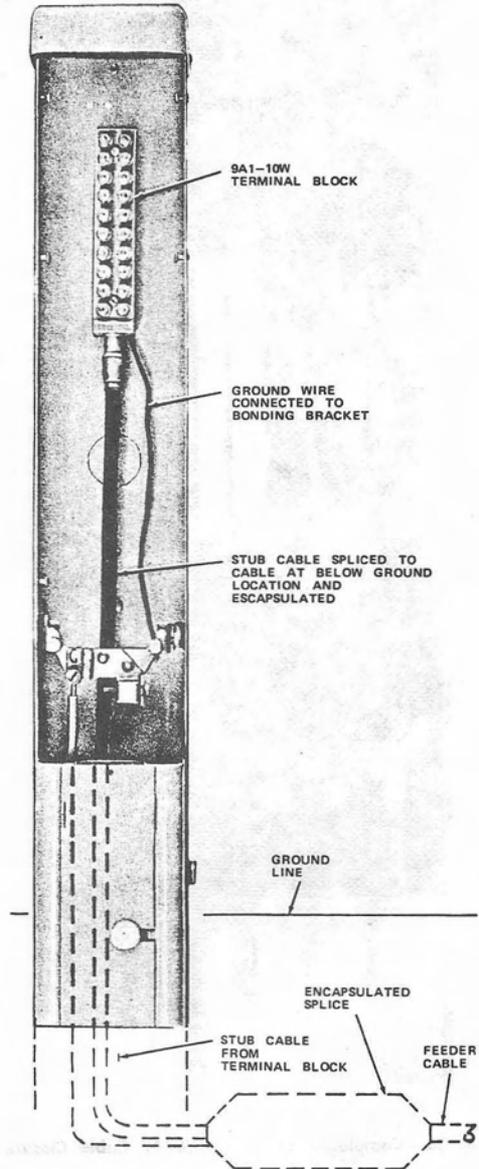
PC4/48M Cable Closure Equipped With 9A1-10W Terminal Block
